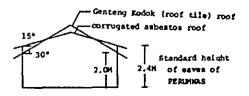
PROPOSED UPPER UNIT WALL SYSTEM
